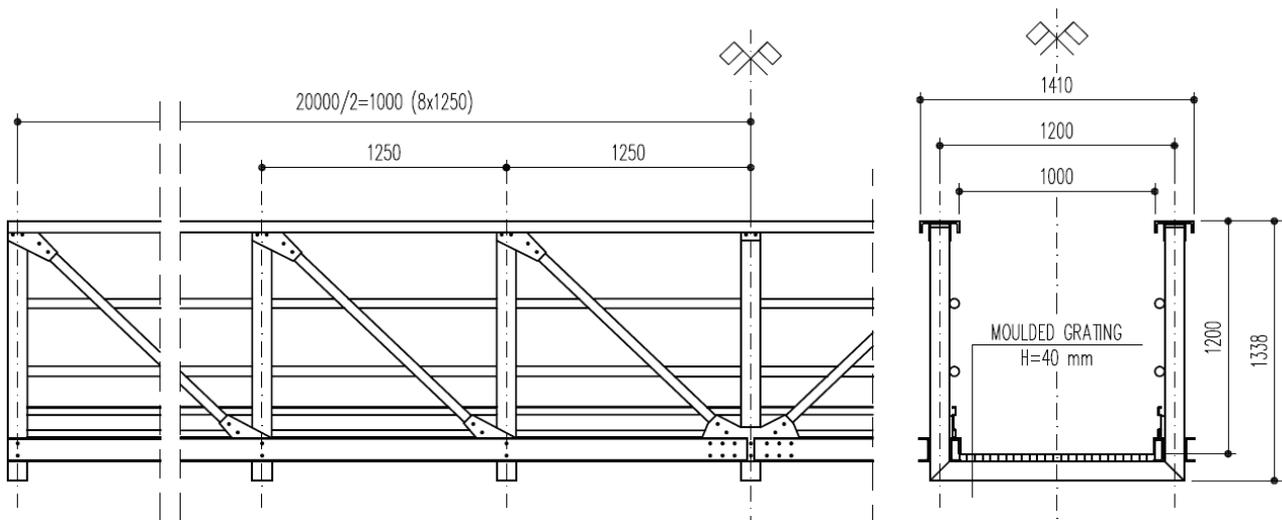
Longitudinal and cross section of the pedestrian truss bridge [18]
